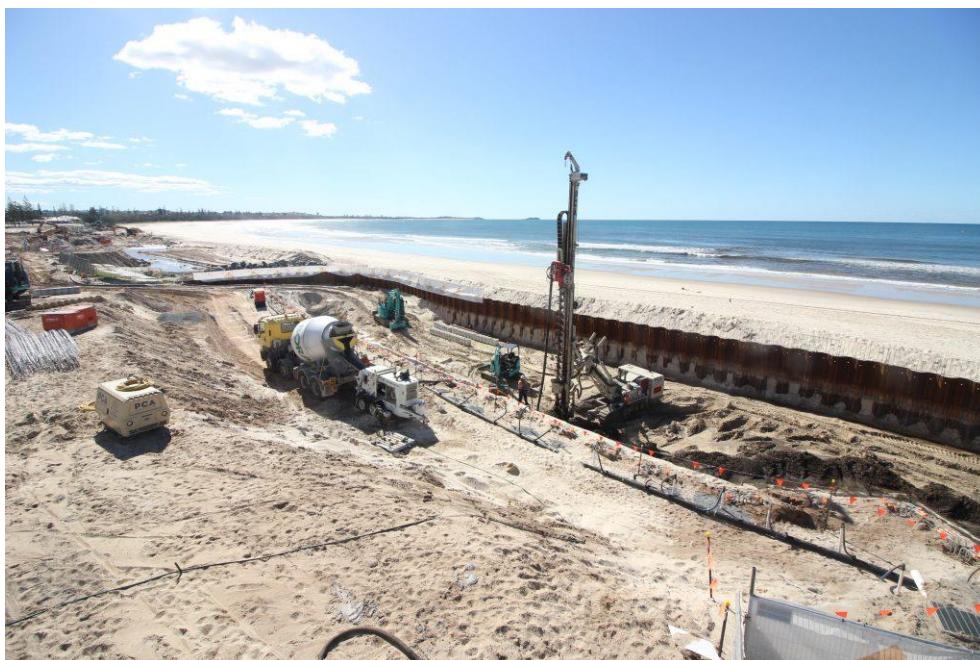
Installation of secant pile wall at Kingscliff Beach (Source: SEE Civil)
